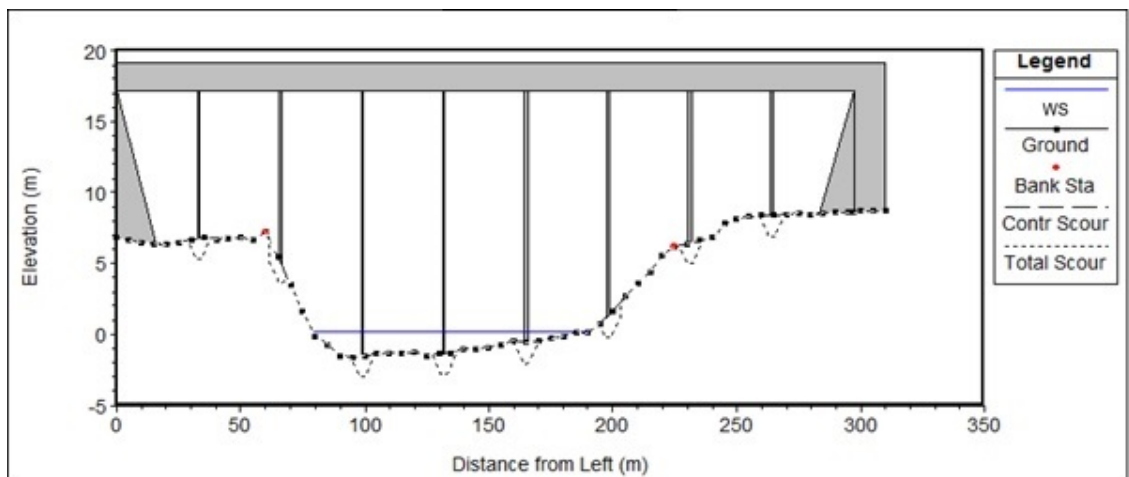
Variation of pier scour at the Manikganj Sadar Bridge under design condition with HEC-RAS model [the maximum local scour is found to be 1.46 m, with 1.5 m pier width, 20 May]
